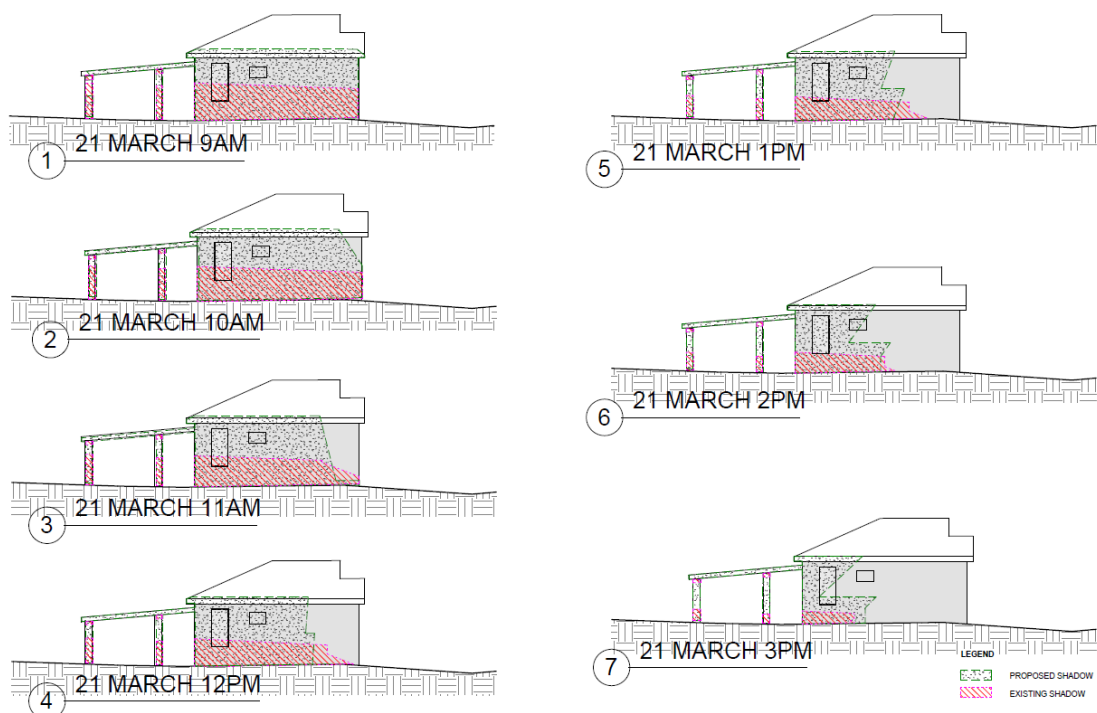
Existing and Proposed development at March/September 21 between 9am to 3pm
